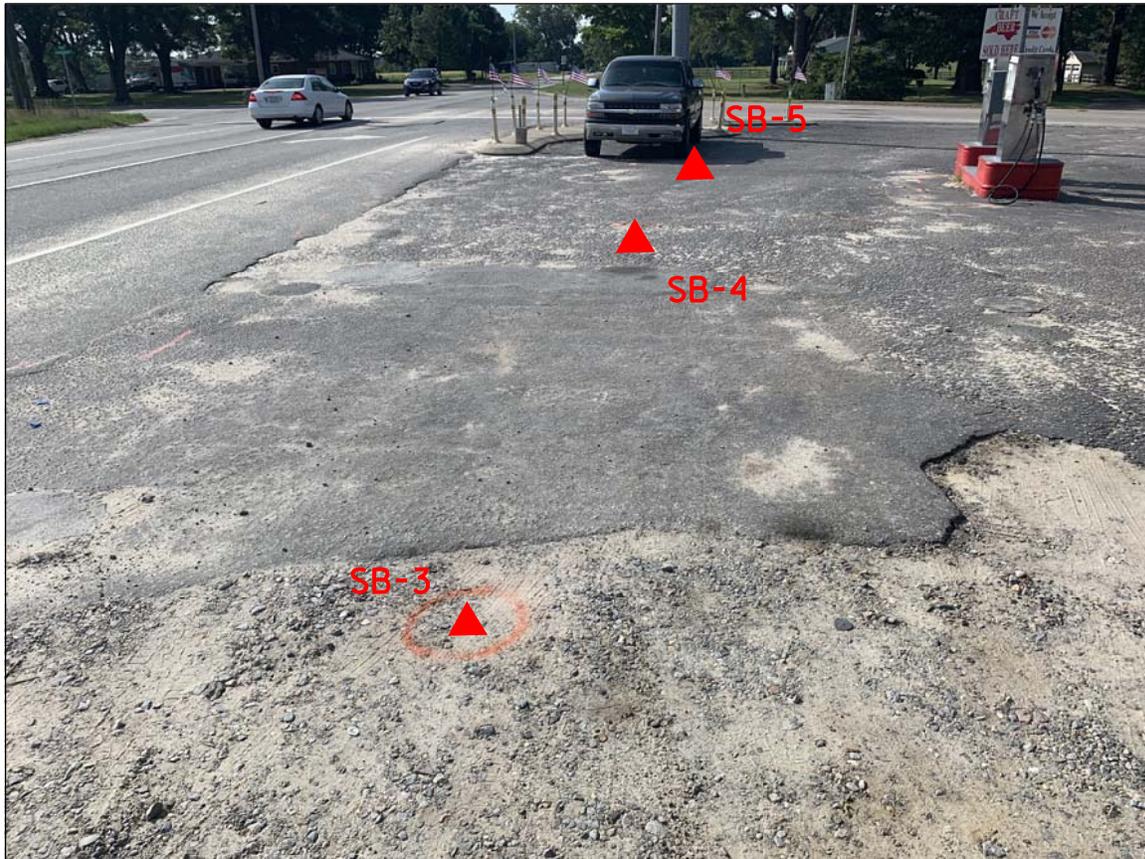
VIEW OF SOIL BORING LOOKING SOUTH
